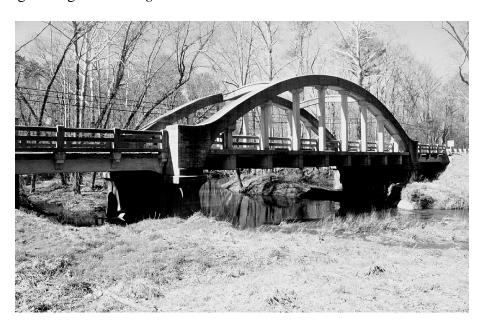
Concrete Through Arch, Built 1926 (Dinwiddie County Structure No. 1005)
